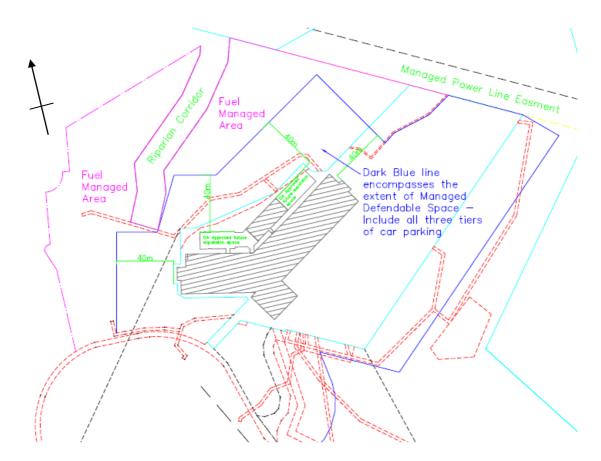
Plan of proposed amended layer showing the extent of the Defendable Spaces (Inner Protection Zones) and Fuel Managed Areas (Outer Protection Zones) referenced to the sketch provided per ABPP Bushfire Protection Assessment for the Construction of the Proposed Magnetic Resonance Imaging (MRI) Facility to the North of and connected to the HMRI Building per ABPP Assessment Report No. B131943 dated 1/05/2013.
